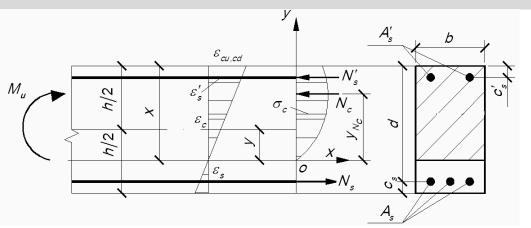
Design scheme of the normal section of flexural RCS rectangular profile with double reinforcement
